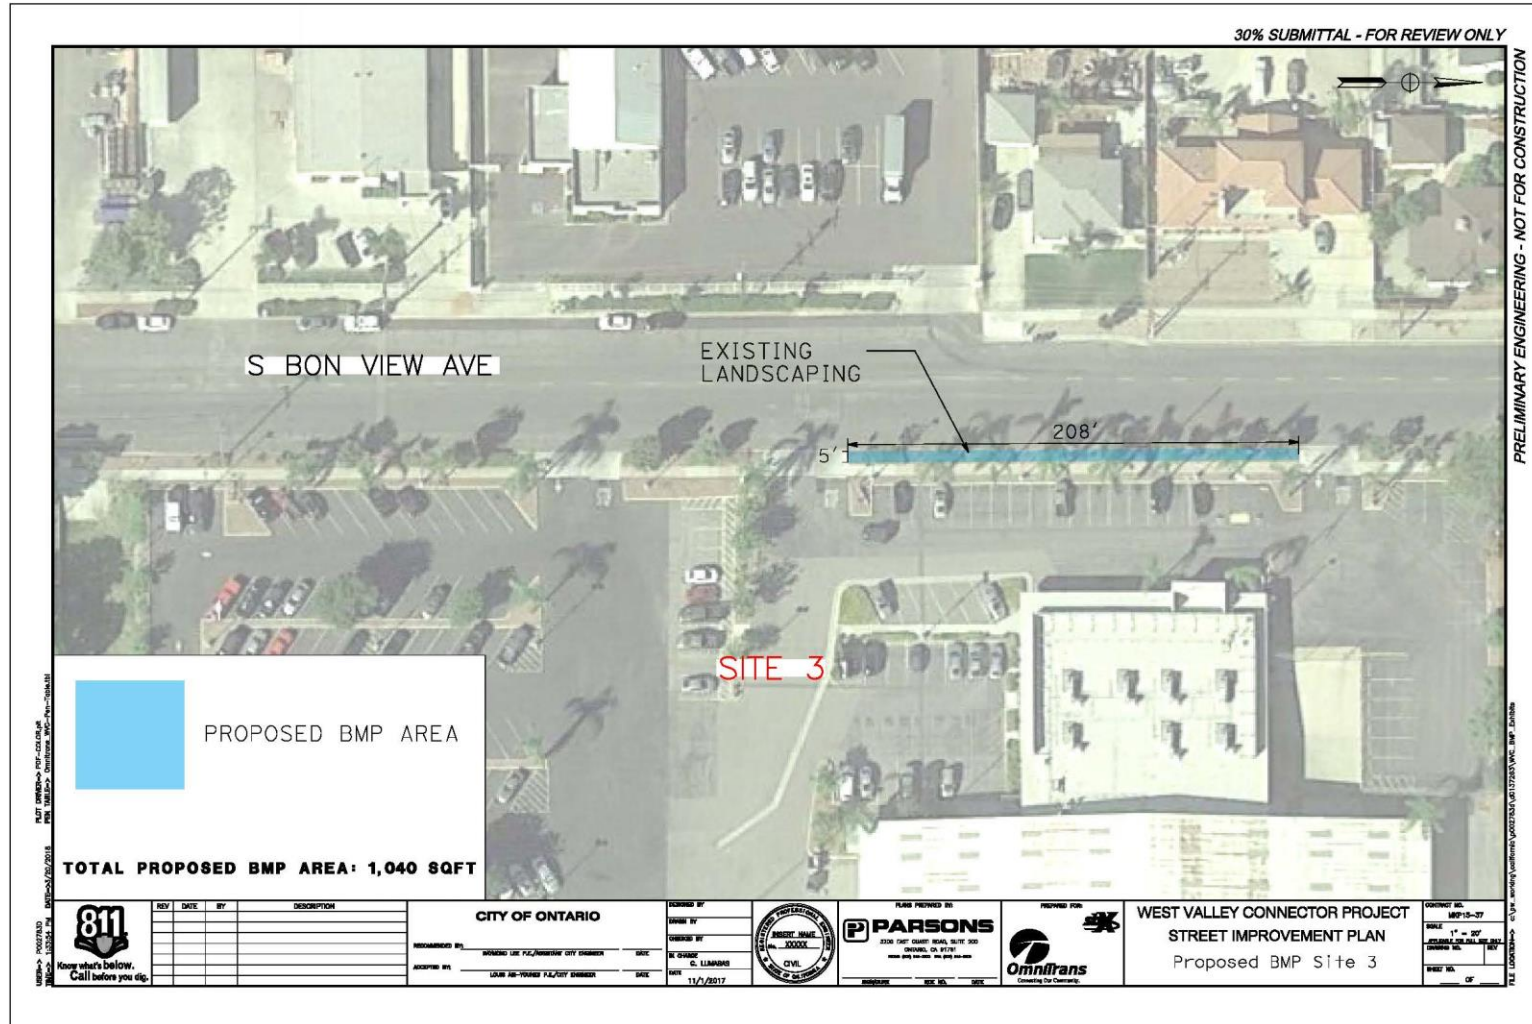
Proposed BMP Area for O&M Facility Site 3
